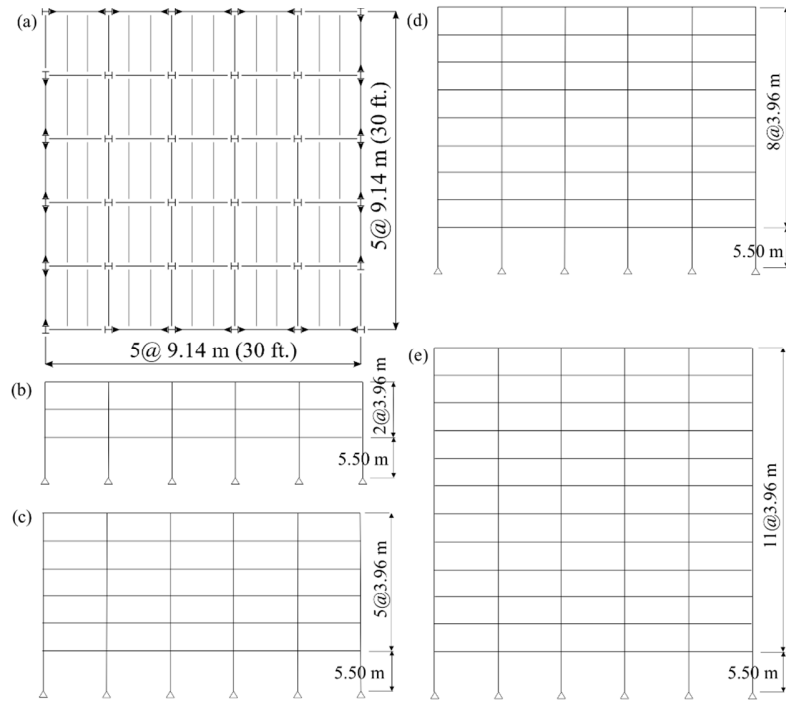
Steel gravity frames (a) plan and elevation of (b) 3-story, (c) 6-story, (d) 9-story, (e) 12-story
